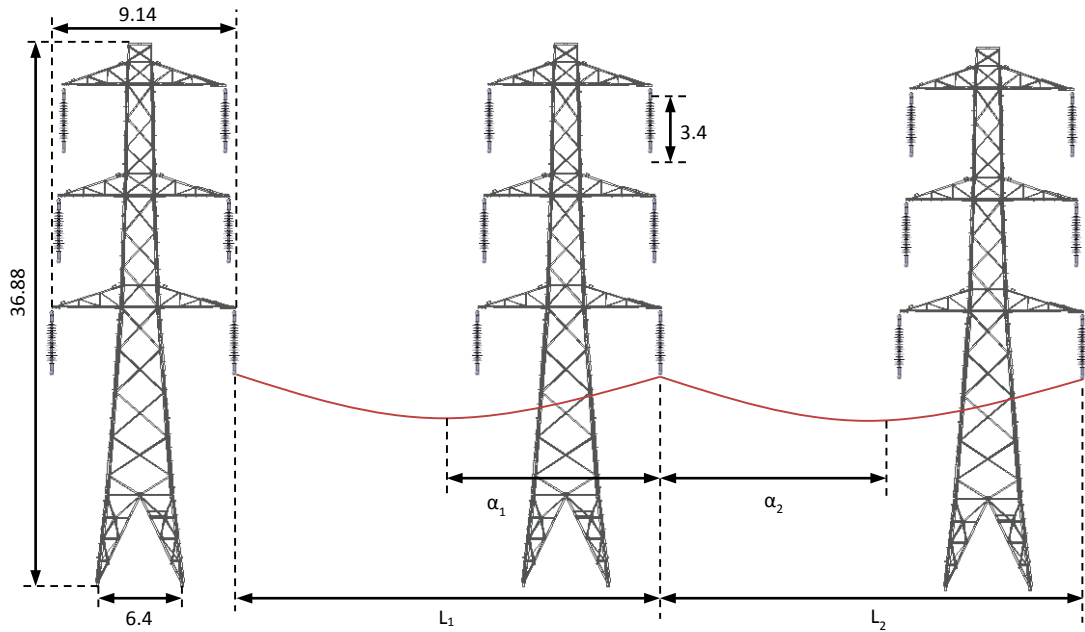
L3 tower and 275 kV OHL dimensions
